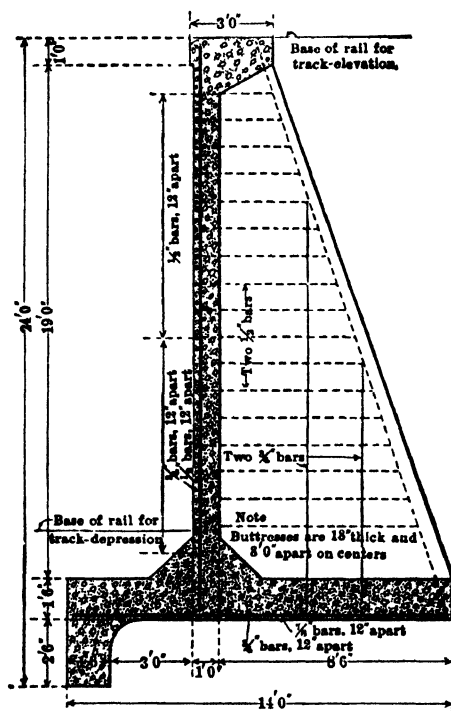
Reinforced-concrete Retaining-wall with Counterforts and Apron
